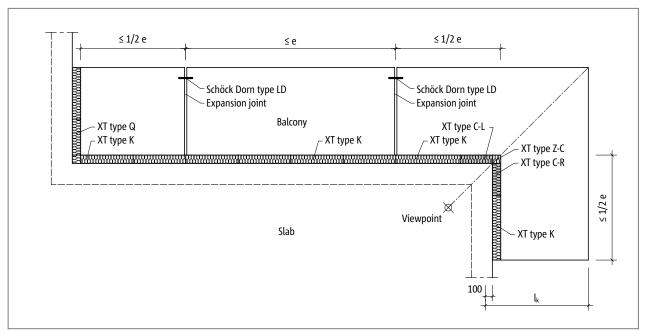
Schöck Isokorb® XT type C: Expansion joint arrangement
